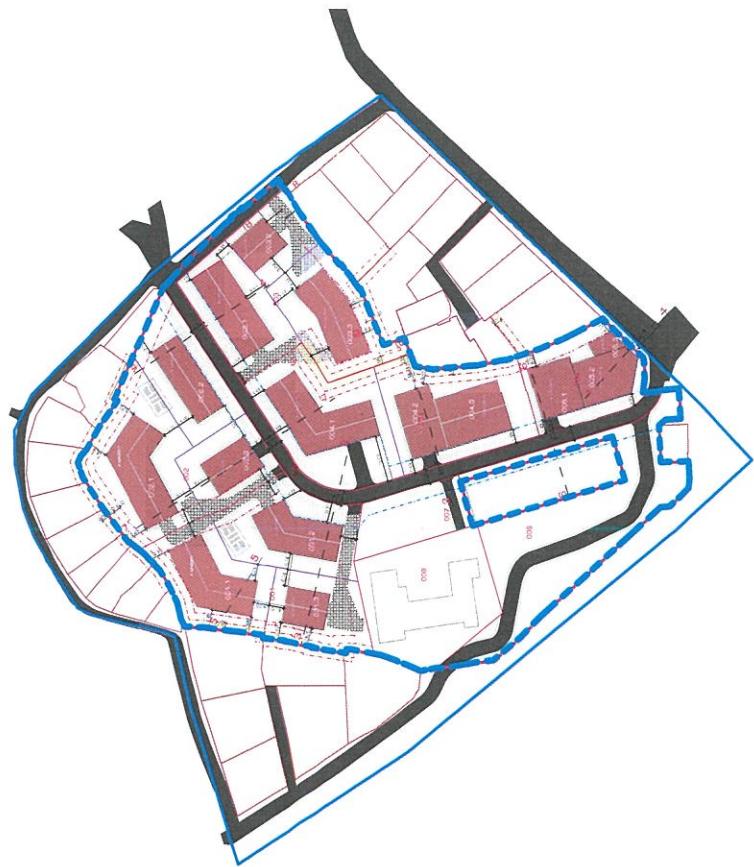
Detailed Site Plan of the proposed construction area showing the proposed site boundary, dimensions, and various components.
